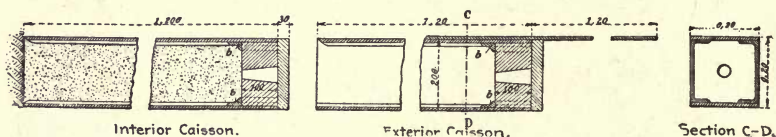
Detail of Metal Beams, or "Caissons," at Versailles End.
